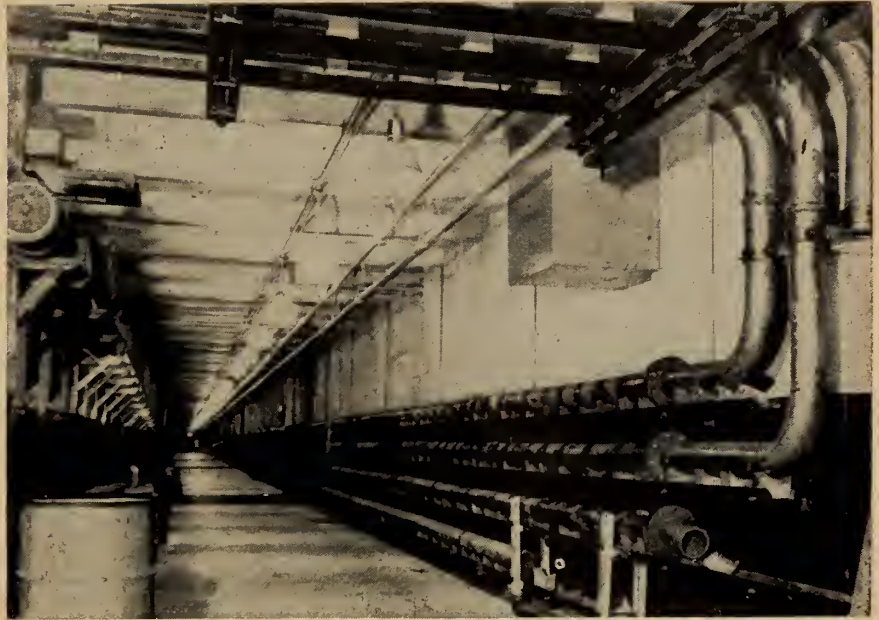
One of the underground tunnels interconnecting major buildings. Four lead pipes carrying spin acid (right wall and across ceiling) are carried on wood blocks evenly spaced in steel channels supported on brackets from the wall.
